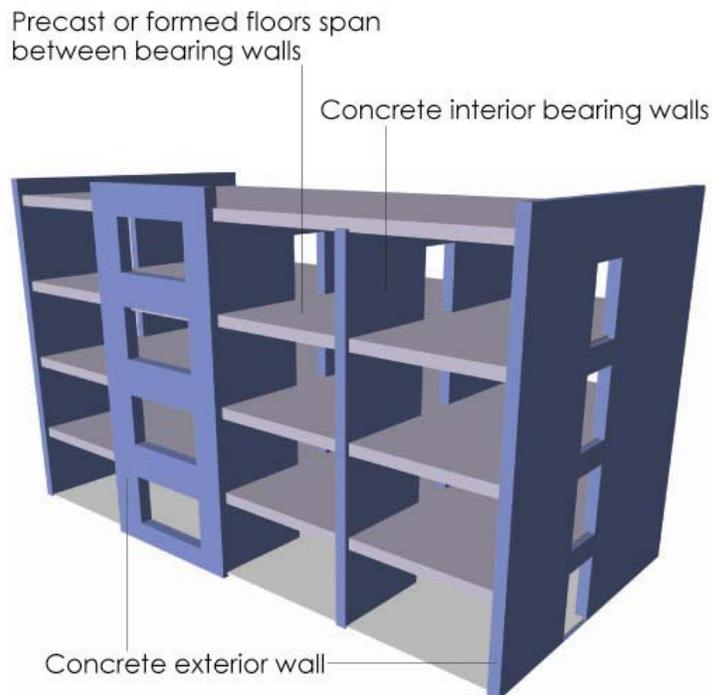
Building Type C2b: Concrete Shear Walls (Bearing Wall Systems)
